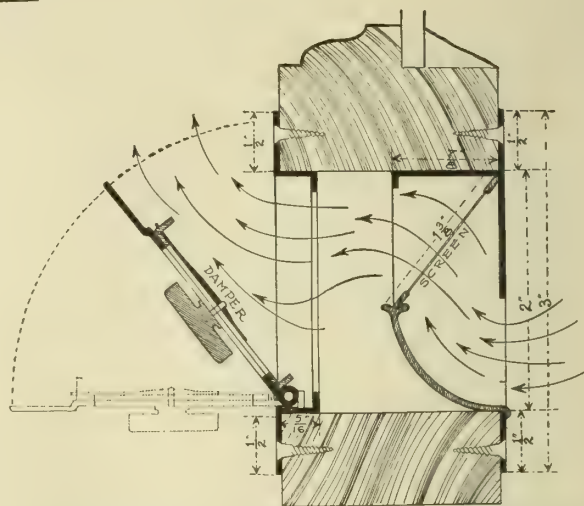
CROSS-SECTION OF "UNIVERSAL" VENTILATOR INSTALLED IN SASH RAIL, SHOWING DIFFERENT DIMENSIONS
